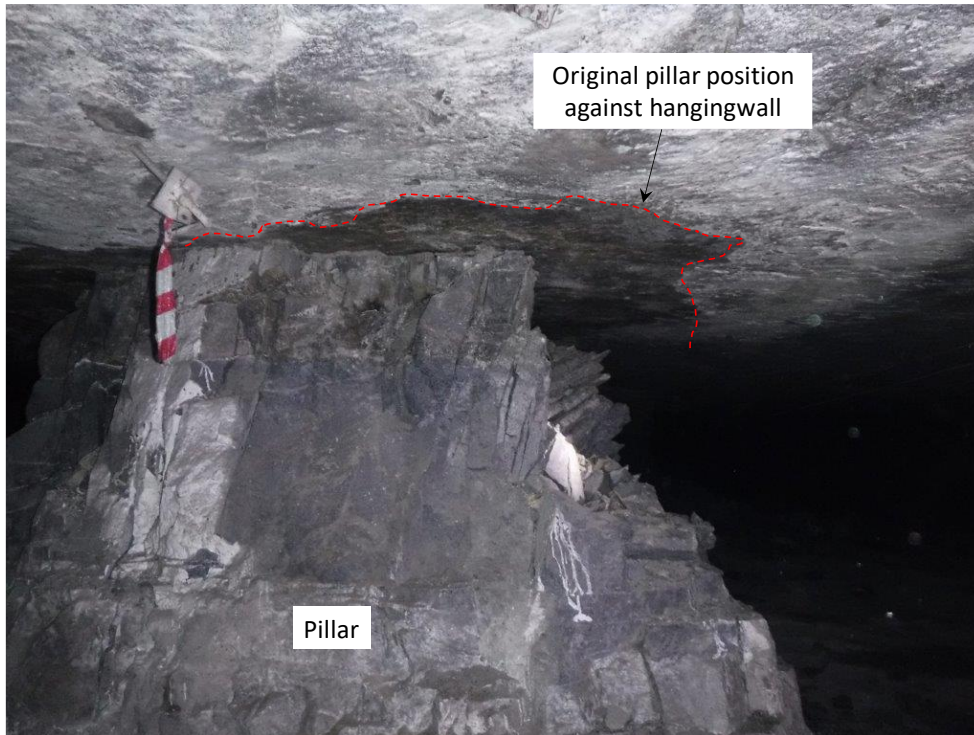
The original position of the pillar against the hangingwall (after Couto and Malan, 2023).
